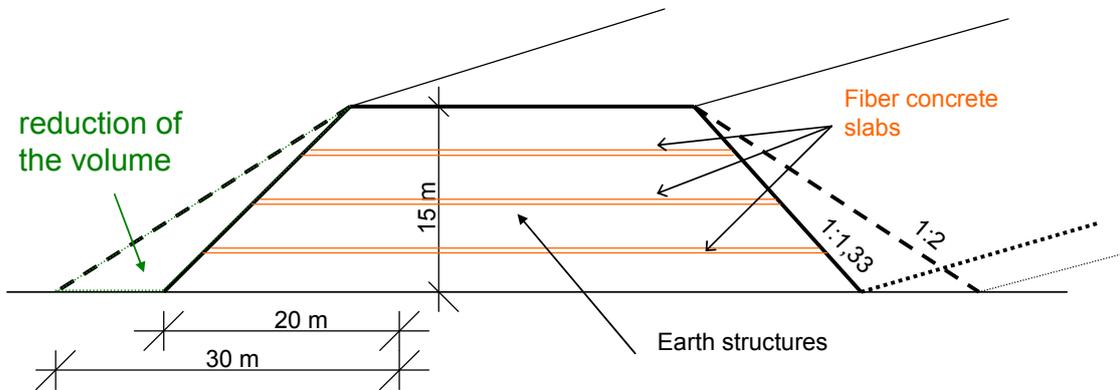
Example of earth structures with inserted fiber concrete slabs
